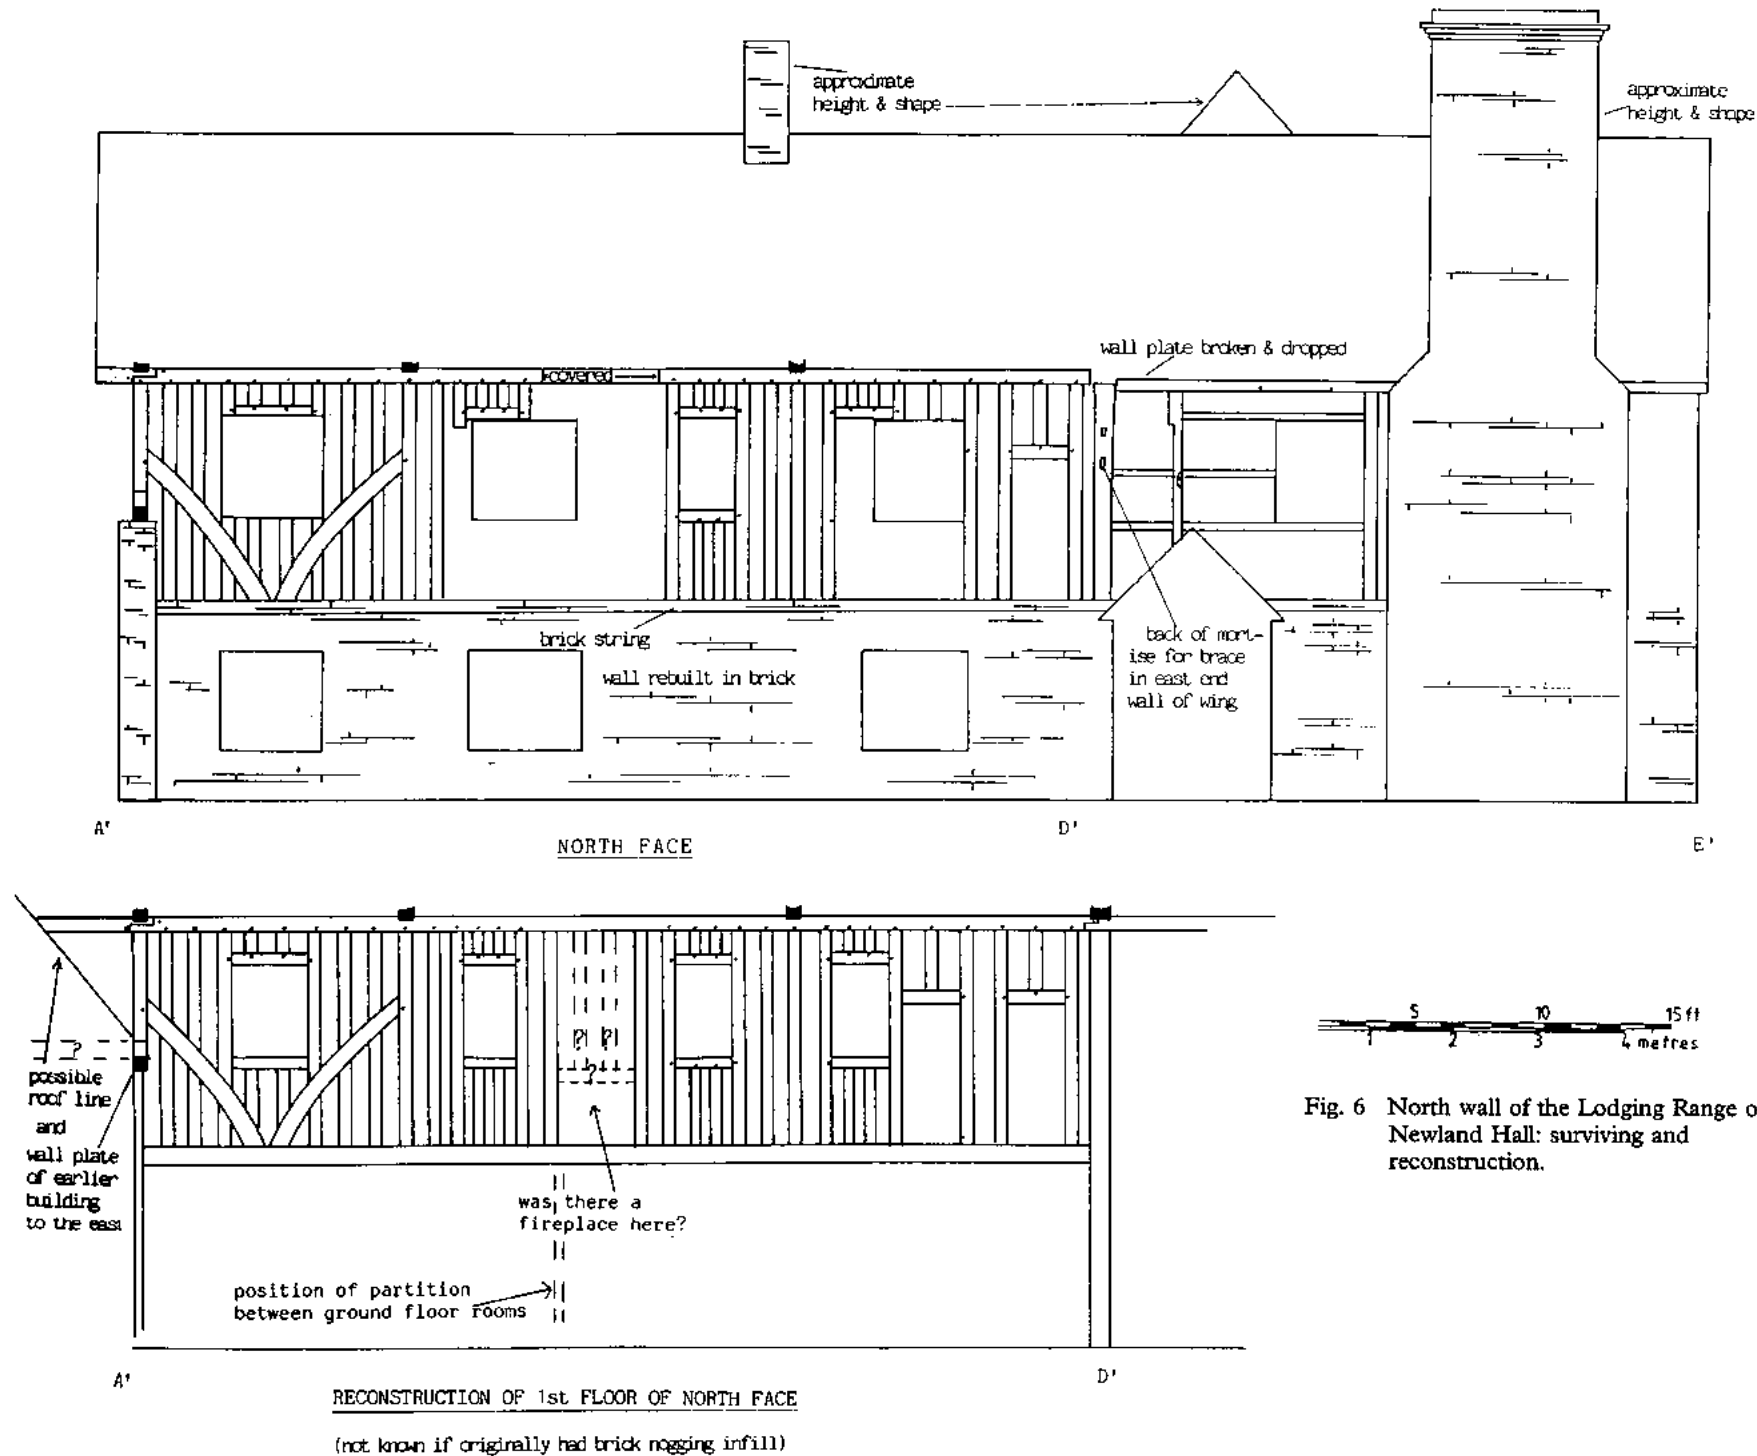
North wall of the Lodging Range of Newland Hall: surviving and reconstruction.
